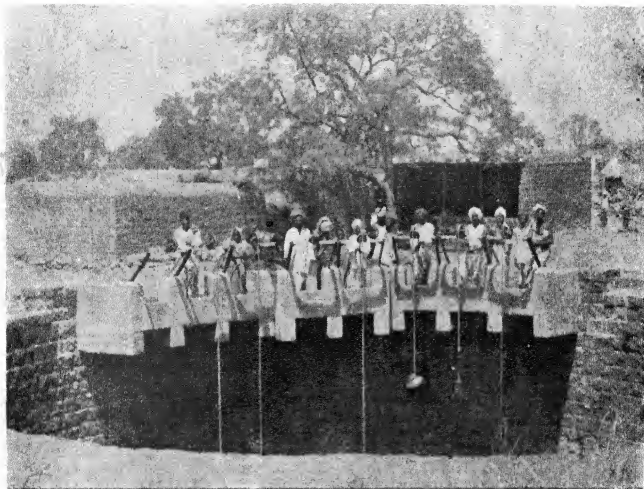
An old step-well remodelled into a draw-well with overhanging platform.
